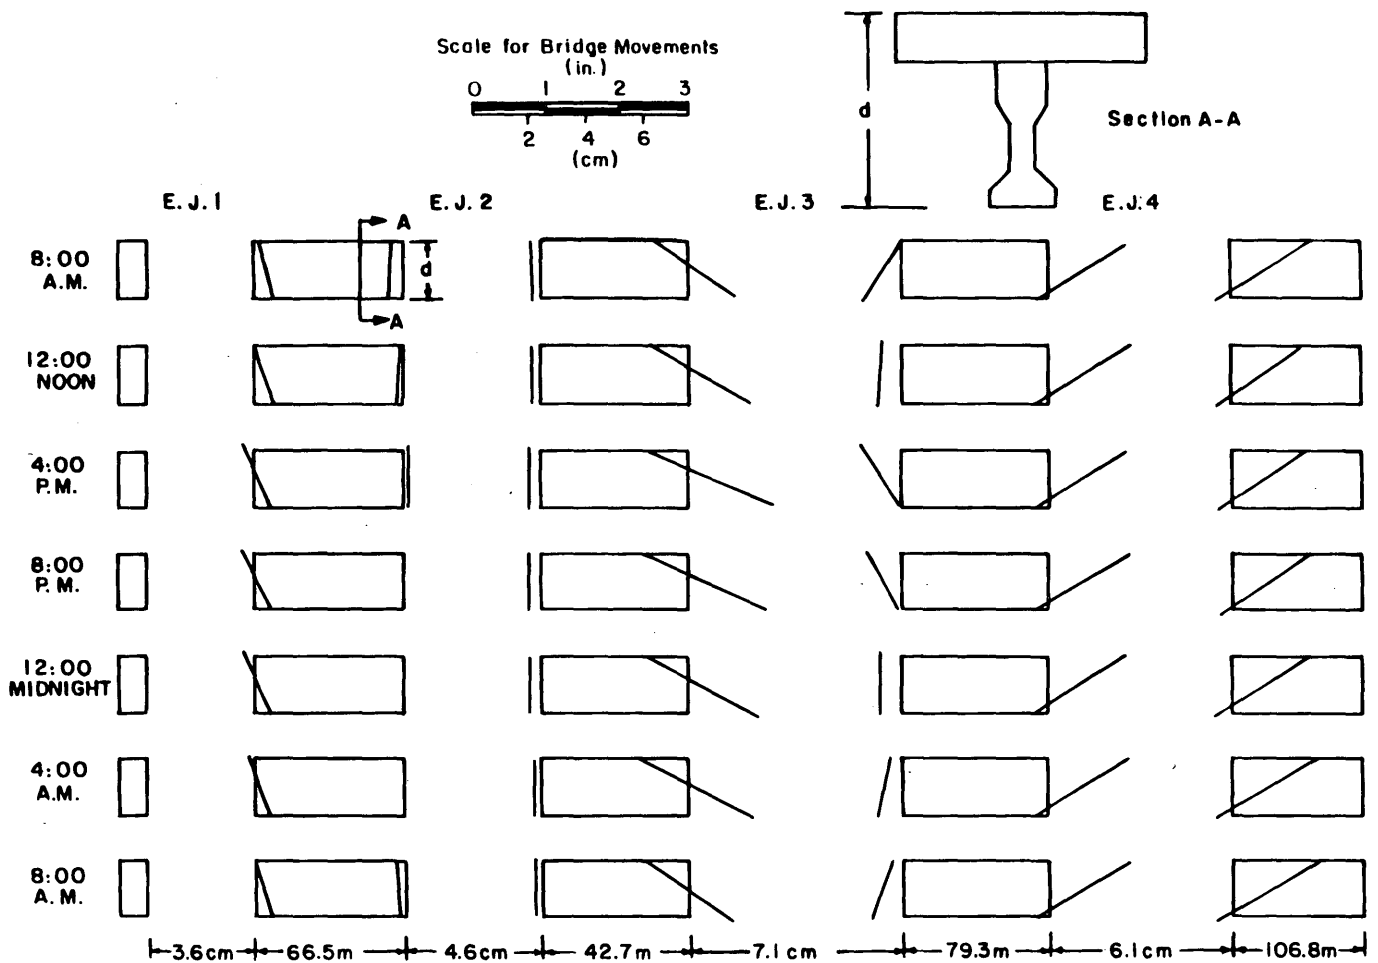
Elevation of north side girders showing 24-hr movements with respect to cap for February 21, 1988. (Note: Longitudinal dimensions of girders and joint spacings are not to scale, but actual end movements are to the scale indicated.)
